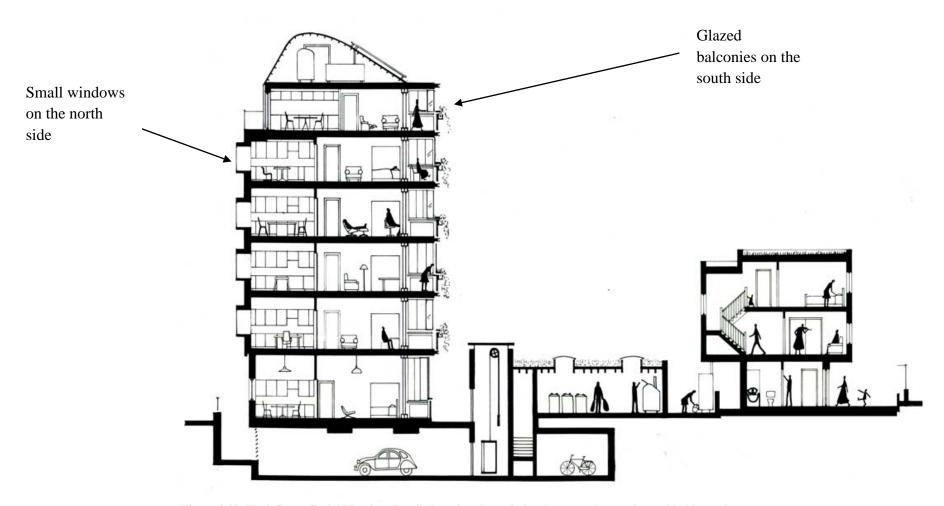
York Street Social Housing. Detailed section through development. Annotations added by author.
